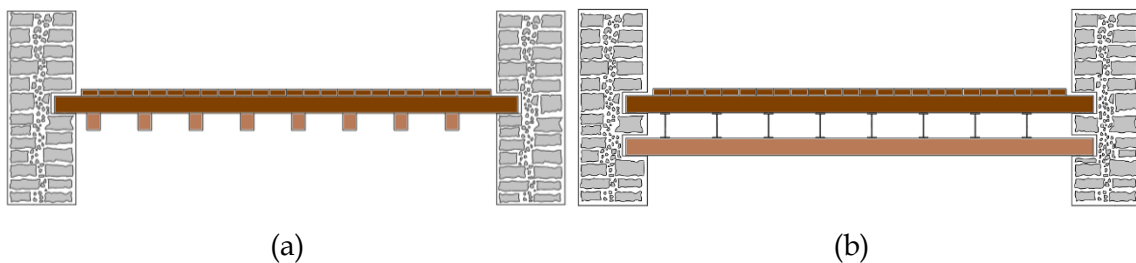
Strengthened timber floors with the introduction of new structural elements: (a) using a new set of parallel beams and (b) using transversal steel elements.
